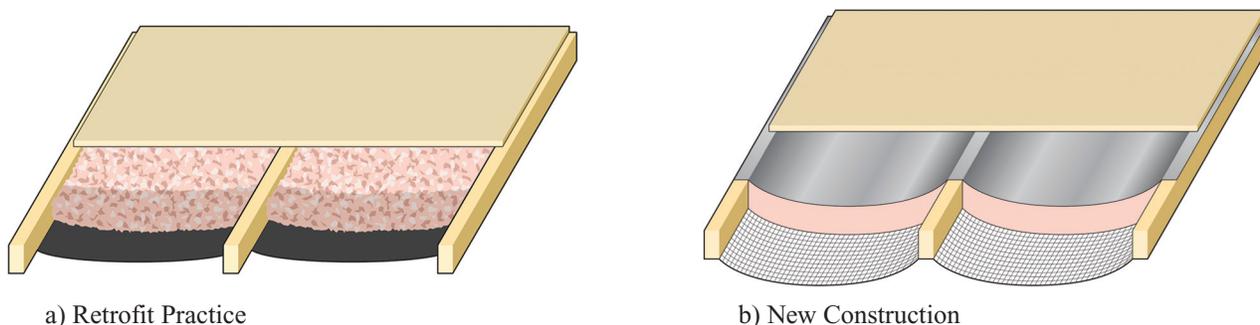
Retrofit and new construction making the attic a semi-conditioned space.
